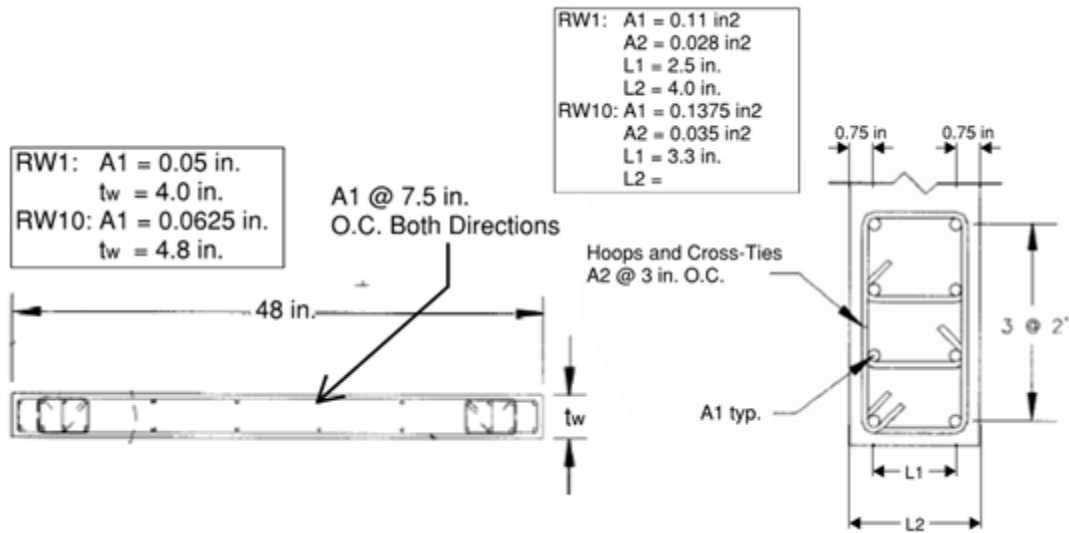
Base View of Section and Boundary Element Detail for Specimen RW1/RW10 (Thomsen et al. 1995)
